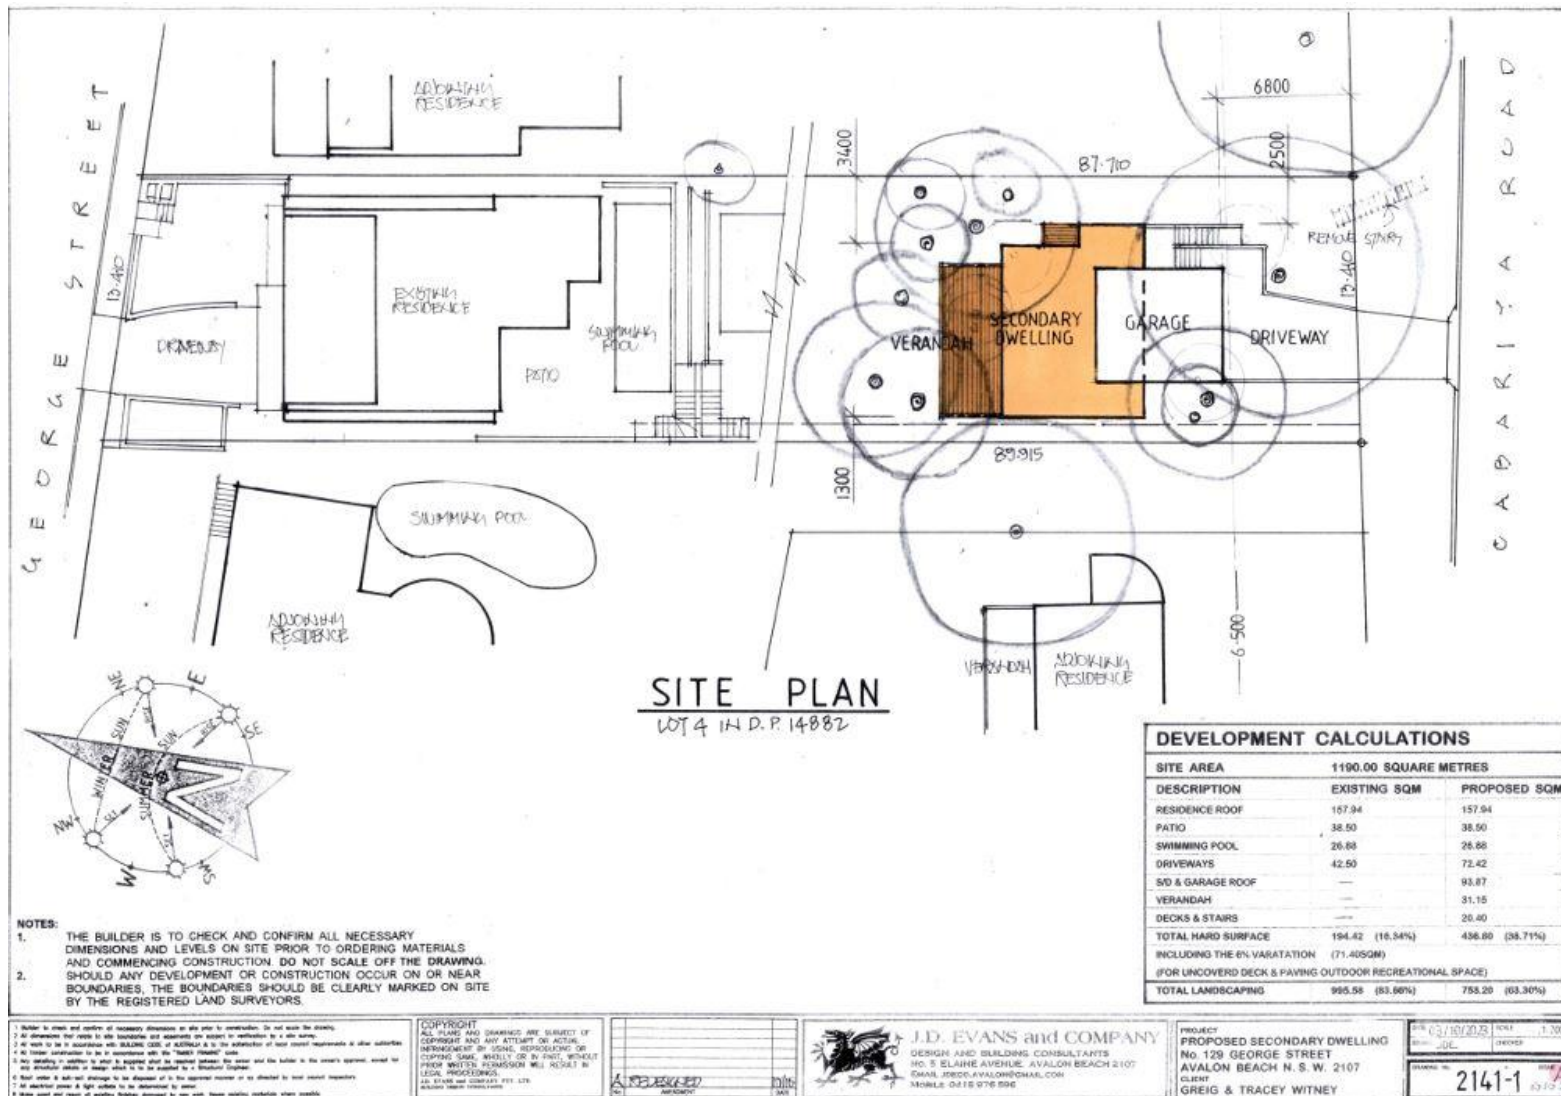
Site plan for proposed secondary dwelling at 154 Cabarita Road, Avalon Beach (for detail see Updated drawings Ref: 2141 - 1A to 7A - J.D Evans and Co. Design and Building Consultants dated 10.10.2024)
